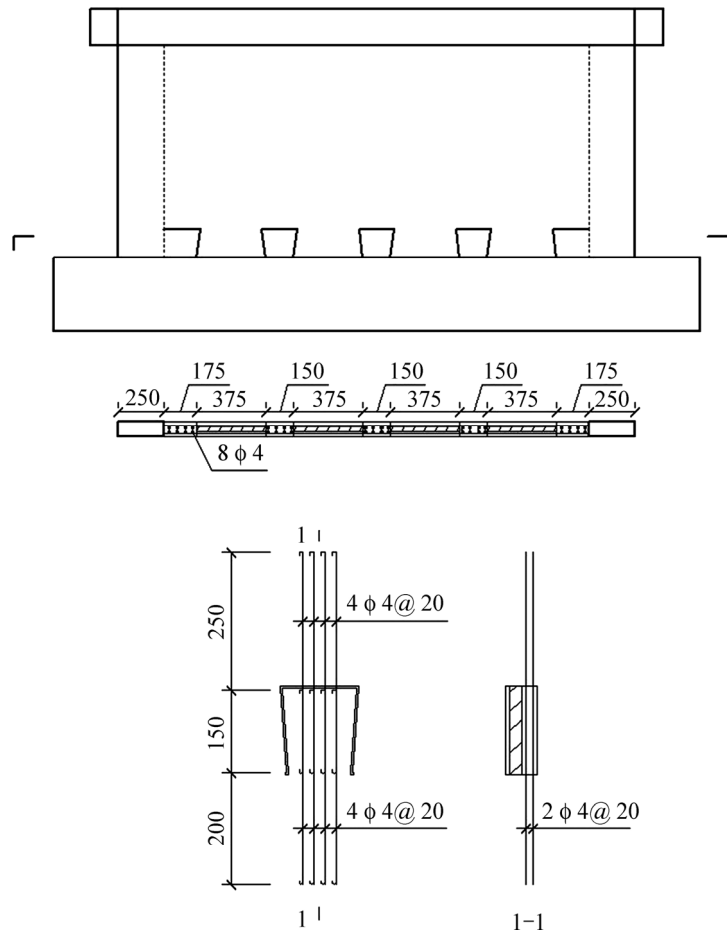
Placing of pins and their steel bars (Unit: mm)
